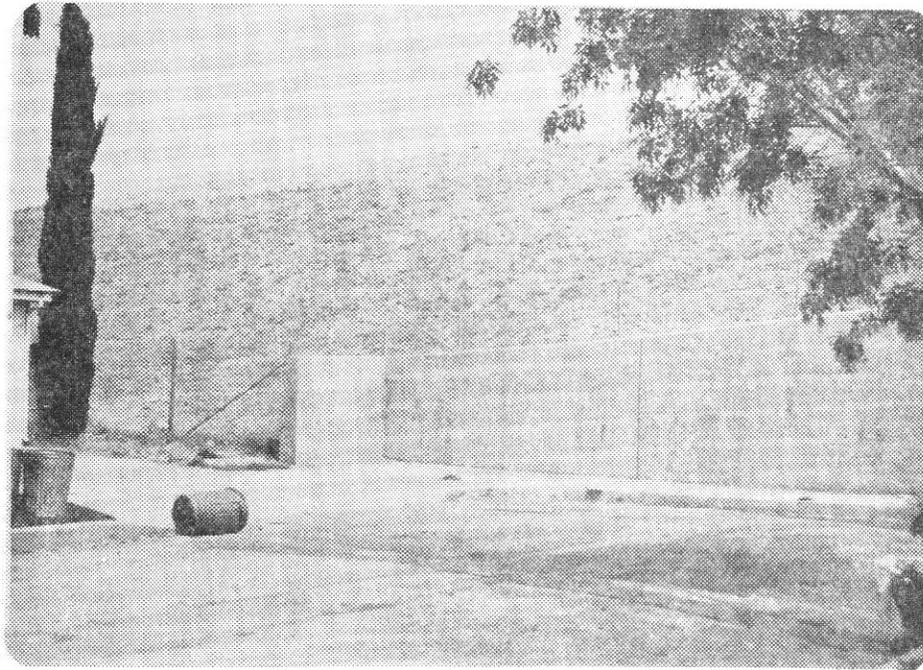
Retaining wall was undamaged but lateral forces transmitted through sidewalk cracked curb.
